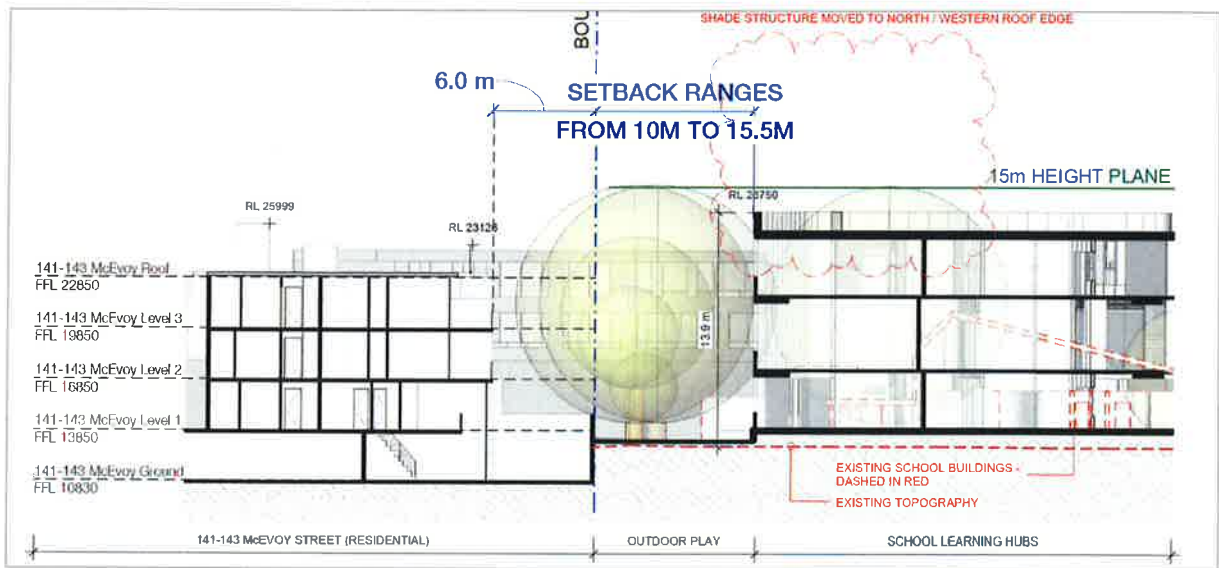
| North/South Section through 141-143 McEvoy Street (RFB) (Source: Applicant's RtS 2018).
